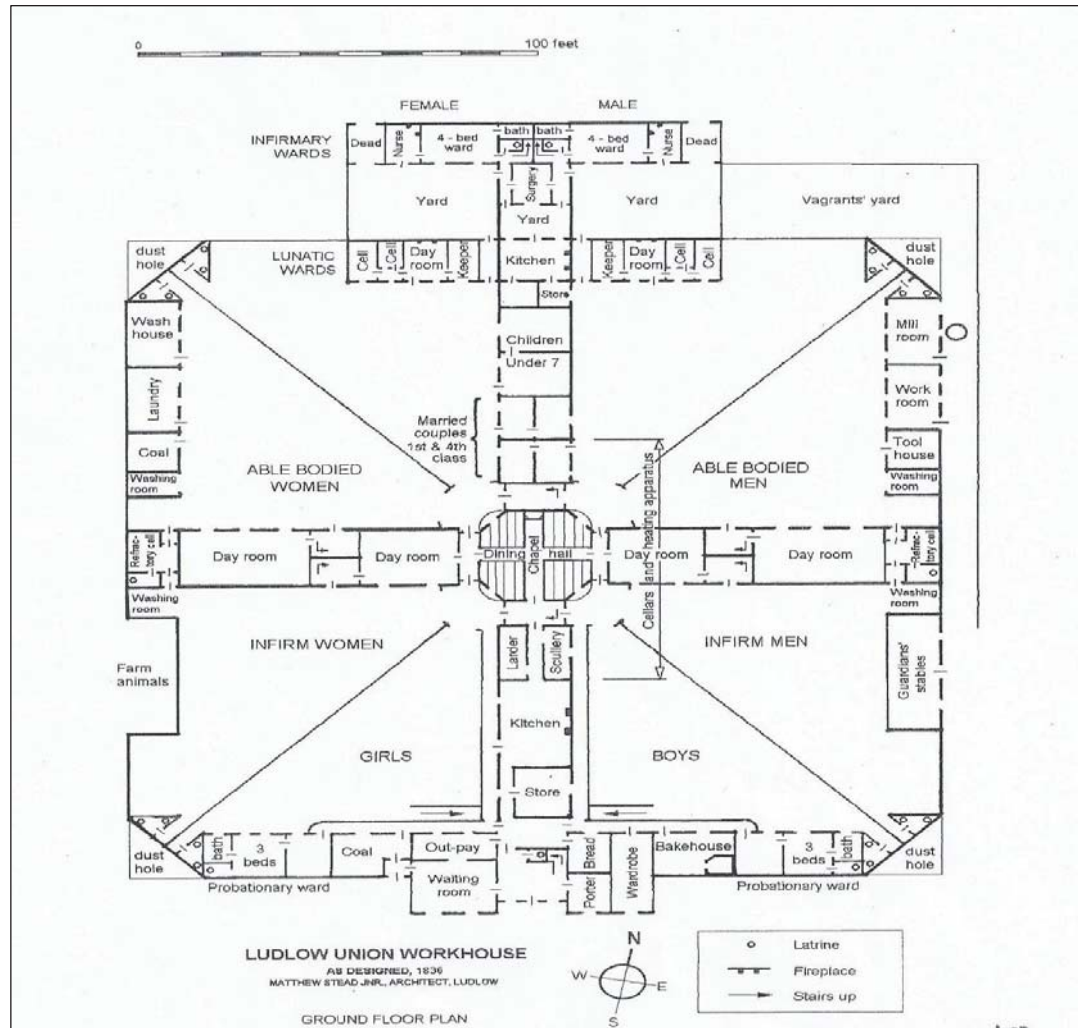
Ground Floor plans for Ludlow Union Workhouse by Matthew Stead, 1836 (after Sumbler, 2016)
